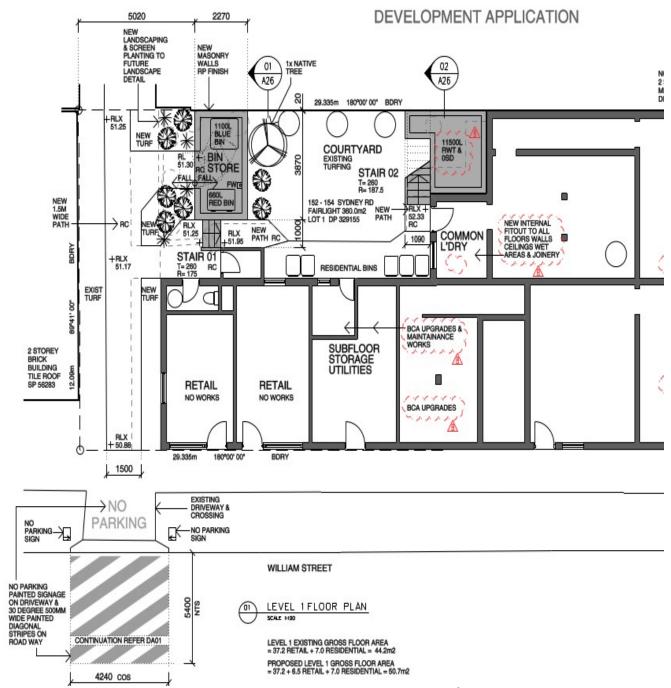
Proposed Level 1 Floor Plan Figure 3 - (Increase by 6.5m² for bin storage)
